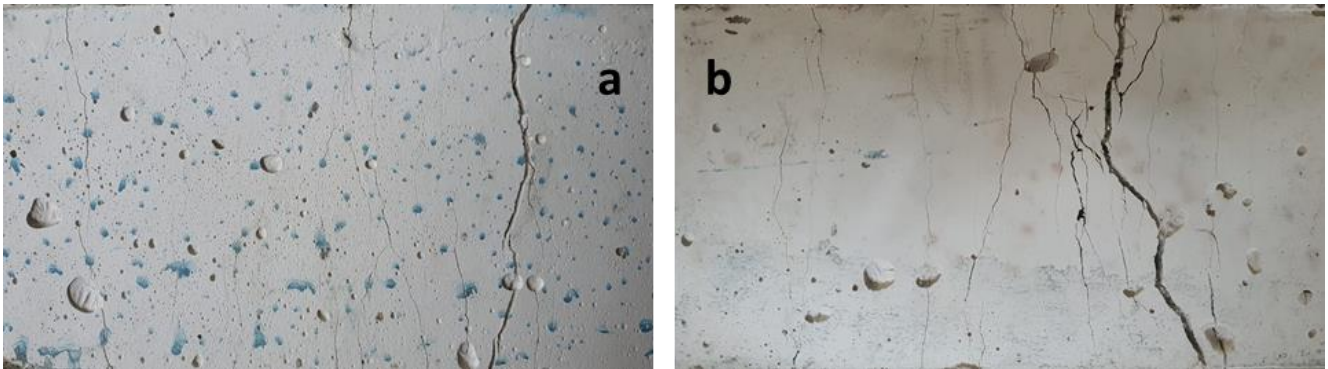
Multiple cracking of expanded glass (a) and rubber (b) containing beams after failure.
